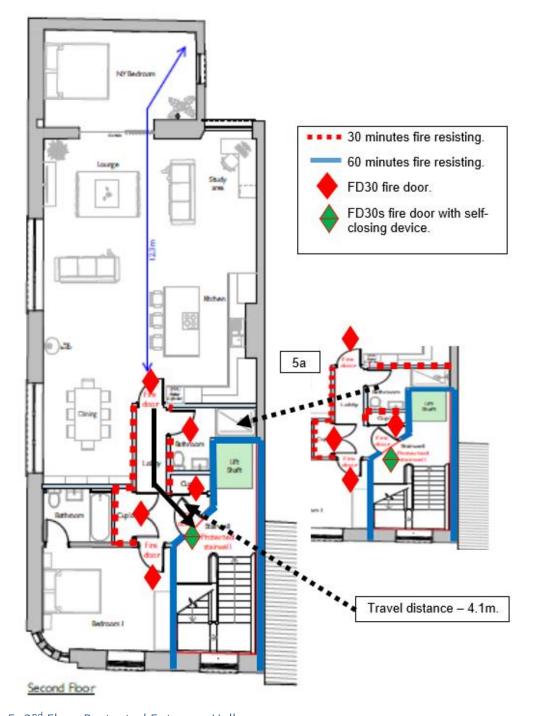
2<sup>nd</sup> Floor Protected Entrance Hallway.
